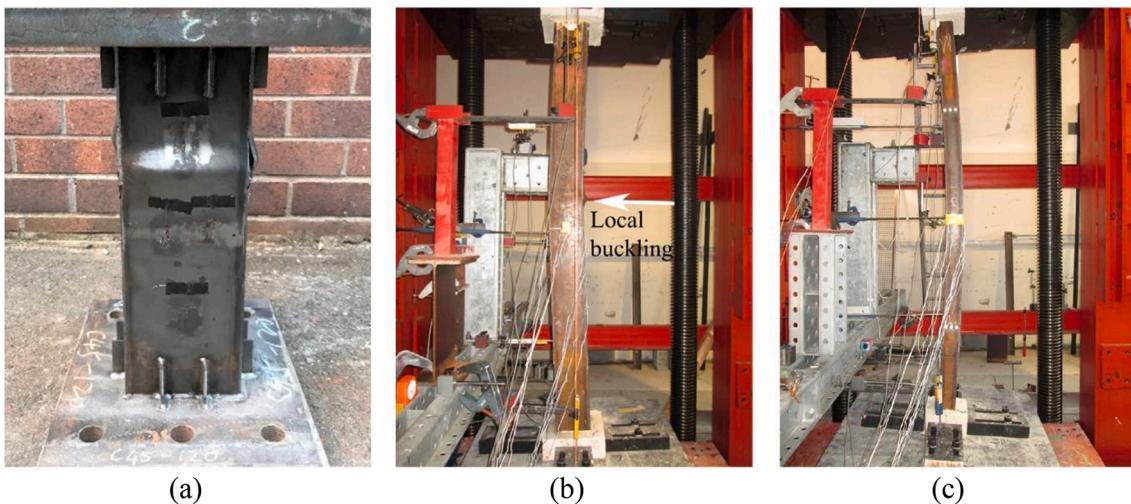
Failure of CFST columns: (a) short column with local buckling [566], (b) intermedia column with local and global buckling [567], and (c) long column with global buckling [567].
